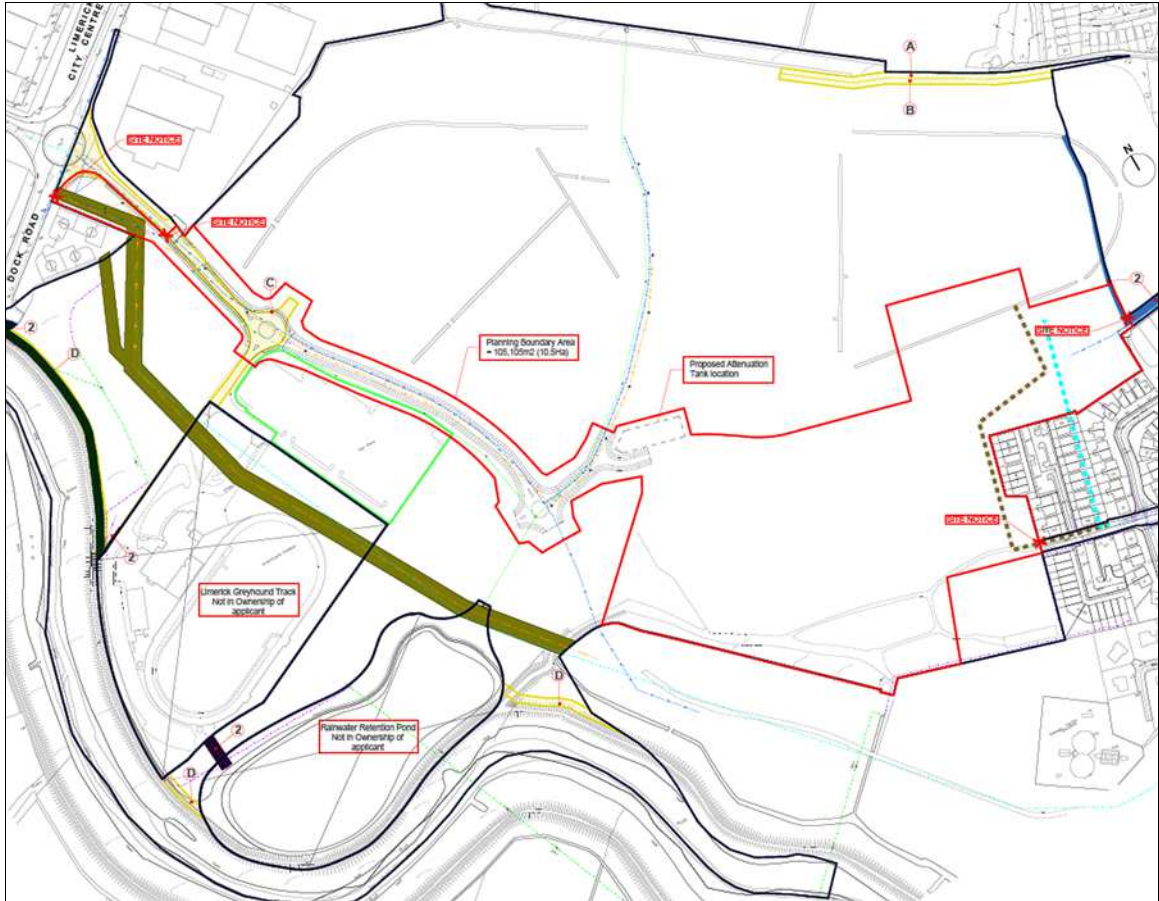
Proposed SHD development site at the former Greenpark Racecourse, Limerick. North to top (for indication only).
